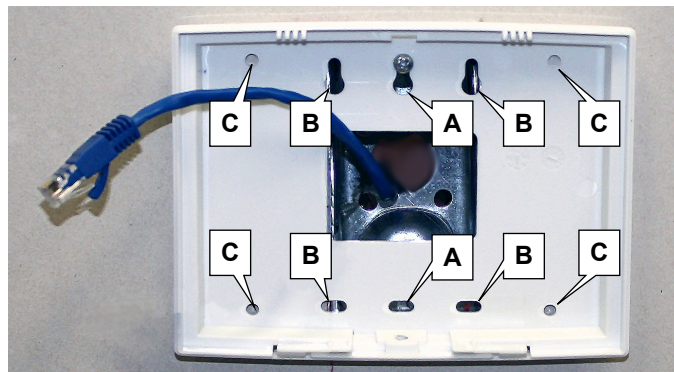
Rear housing mounting holes for single-gang (A) and double-gang (B) electrical boxes, and four all-purpose holes (C)
